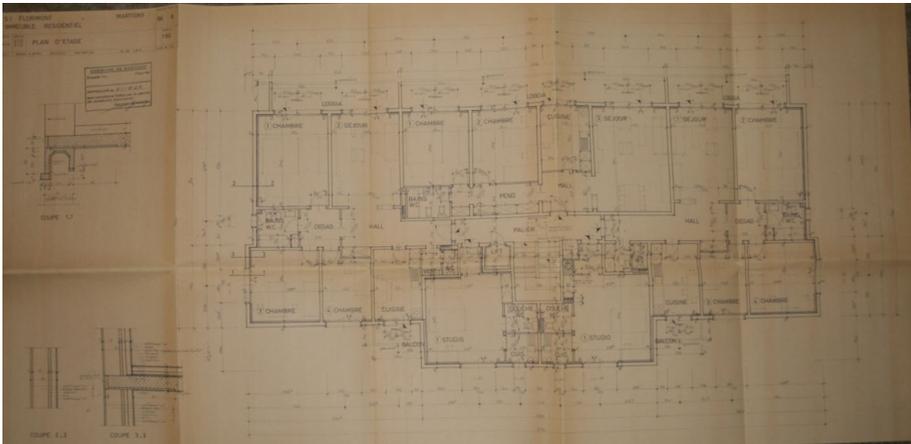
Building drawing including construction detailing (Kazantzidou-Firtinidou et al. 2015)
